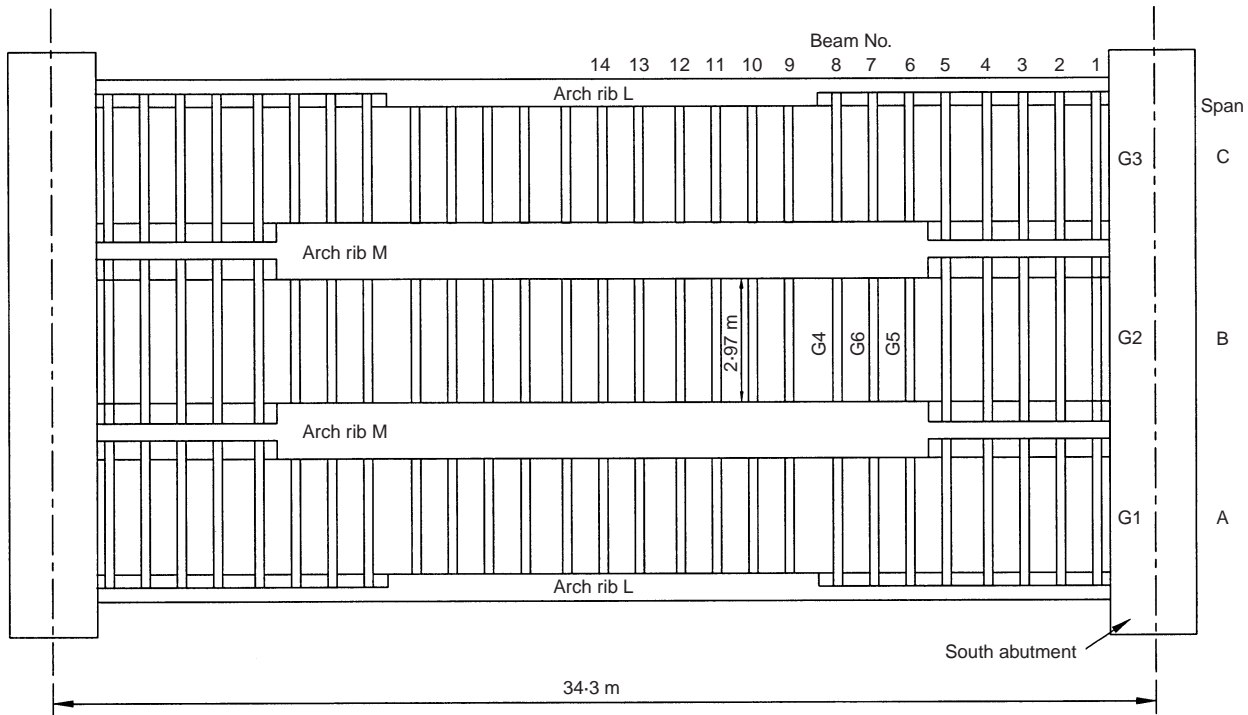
South span of Gunthorpe bridge showing the lateral beams spanning the arch ribs
